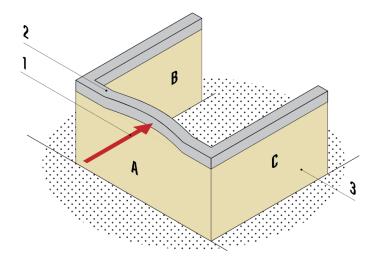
Part of a house without the roof. Wall A that experiences a sideways force from shaking (1) is supported mainly by the tie beam (2) that connects the top of wall A to walls B and C (3).
